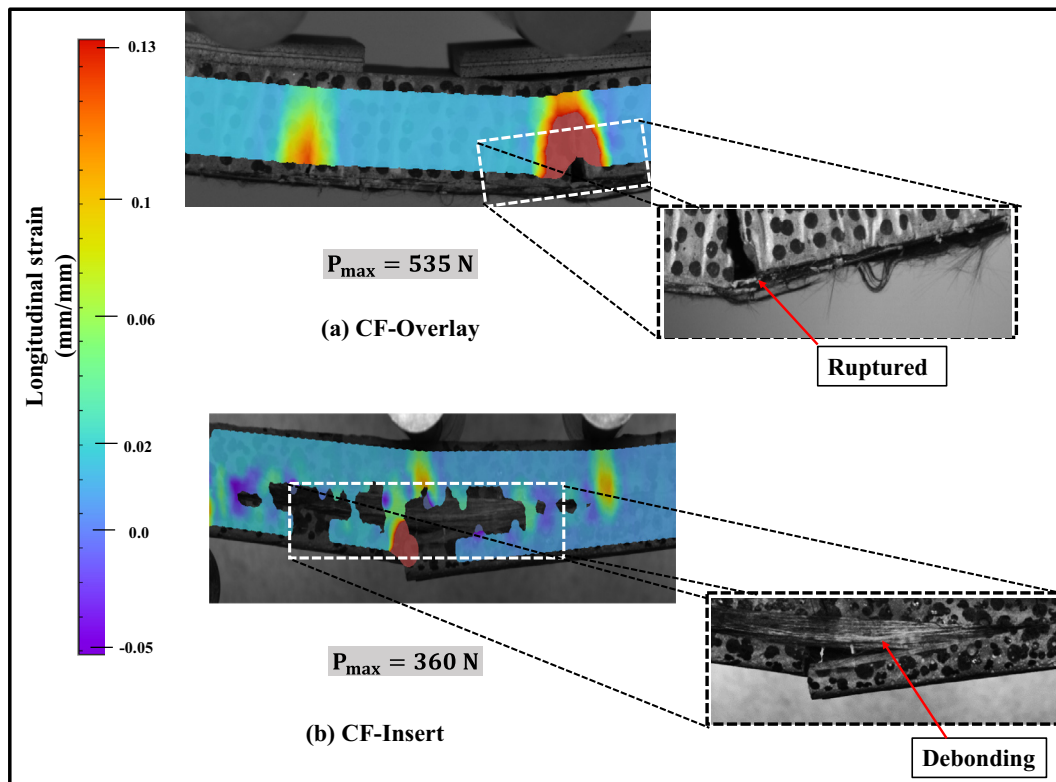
Failure of mortar specimens containing CF specimens under 1 mm/min.
